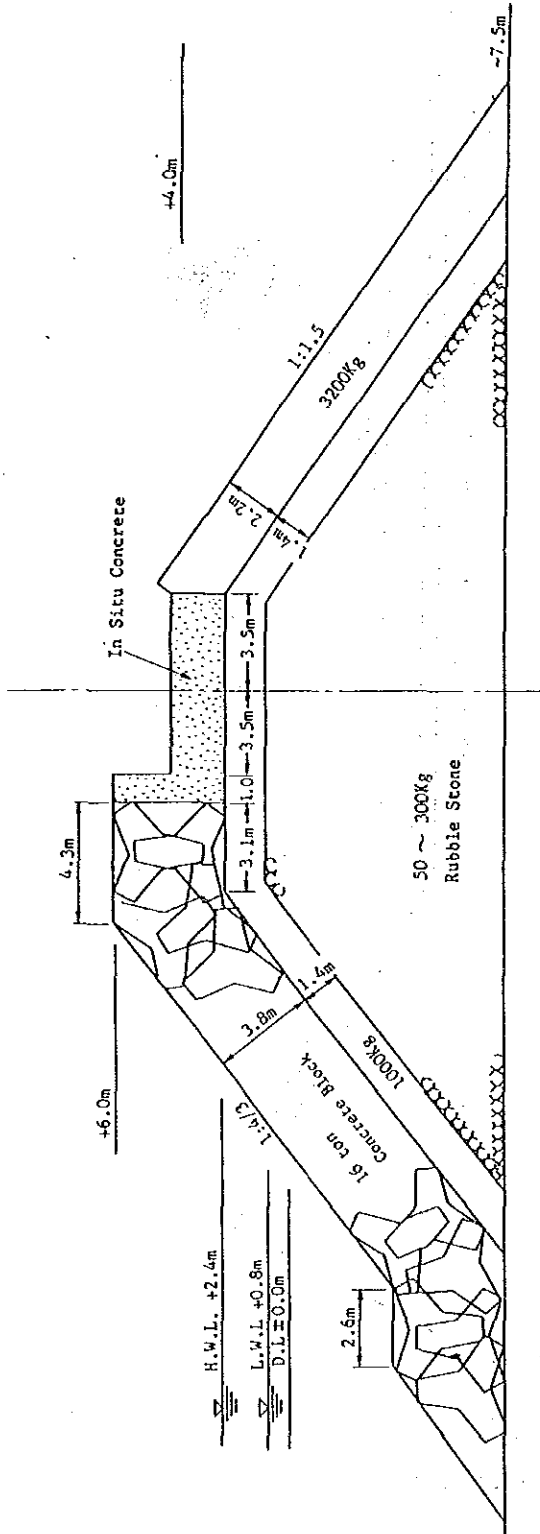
(1) Standard Cross Section of the Breakwater (1)
